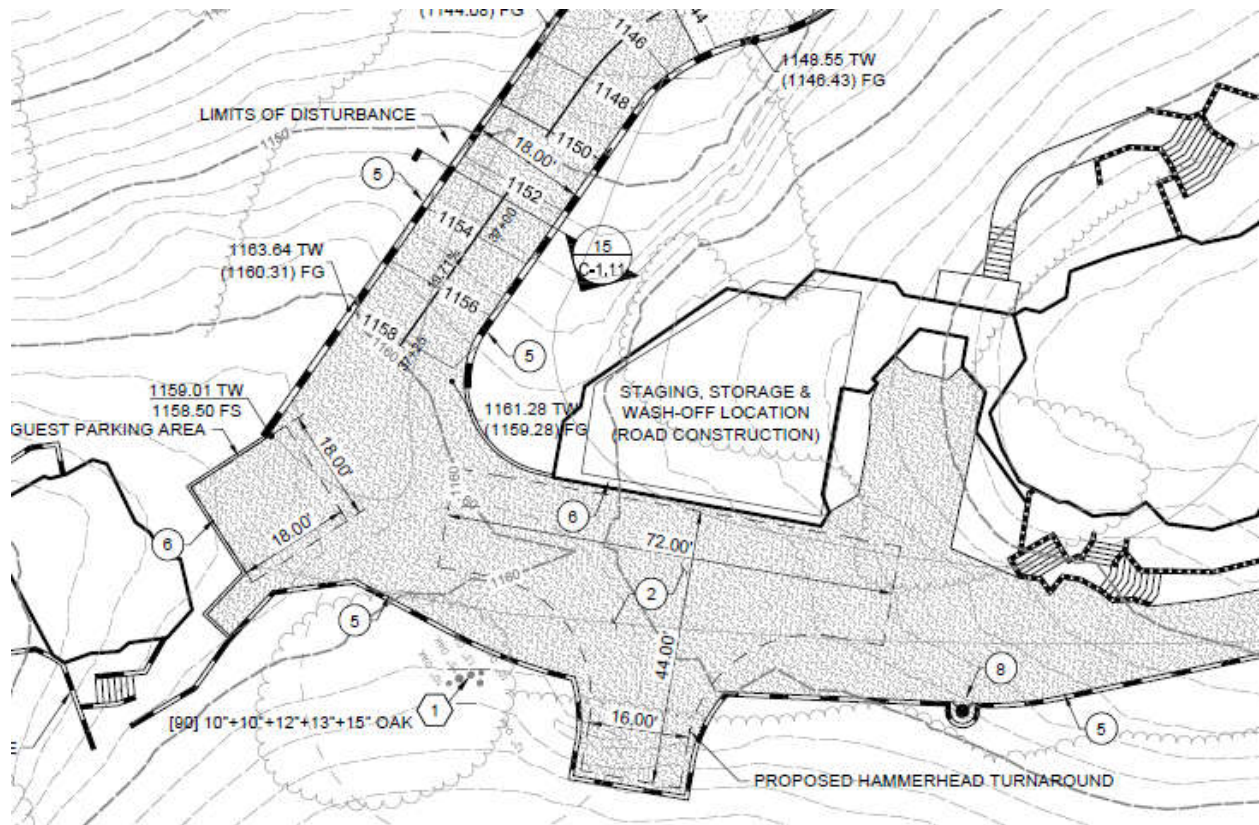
Section C-1.10 shows a multi-trunk single specimen.
